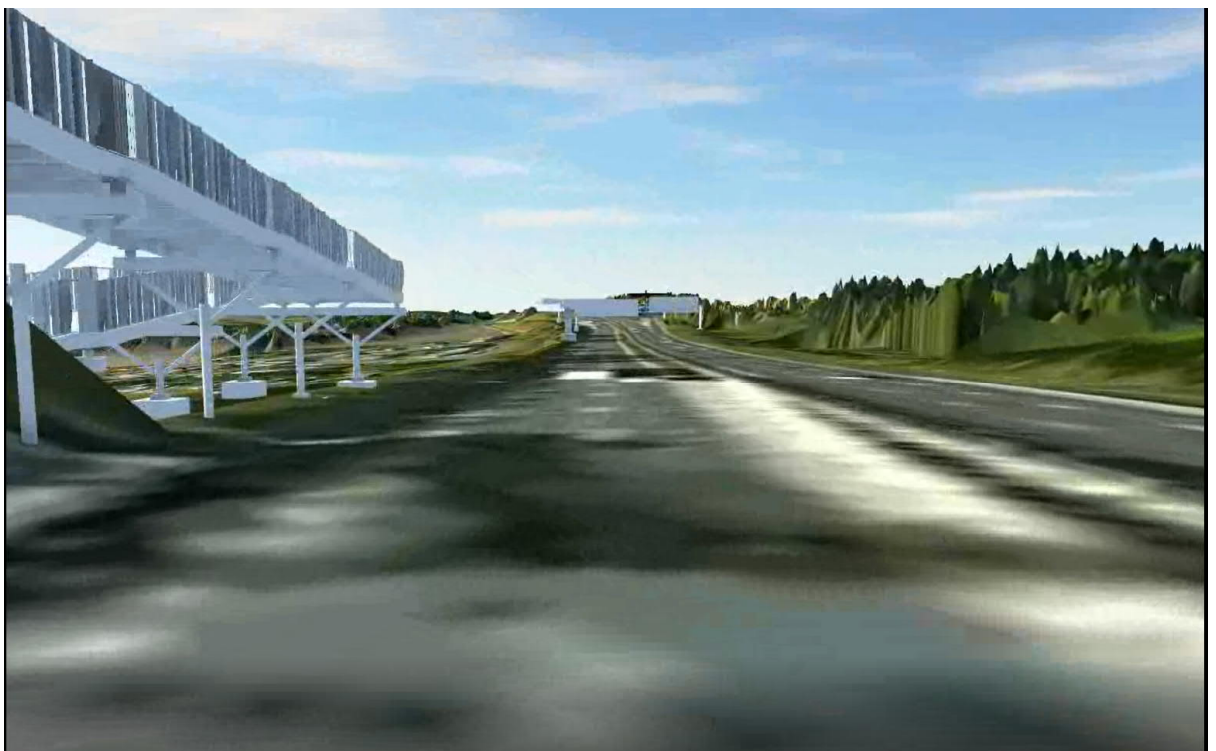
On passing the replacement footbridge, the combined effect of the cantilever and superspan structures would interrupt the view of the Angel of the North as it descends beyond intervening woodland
